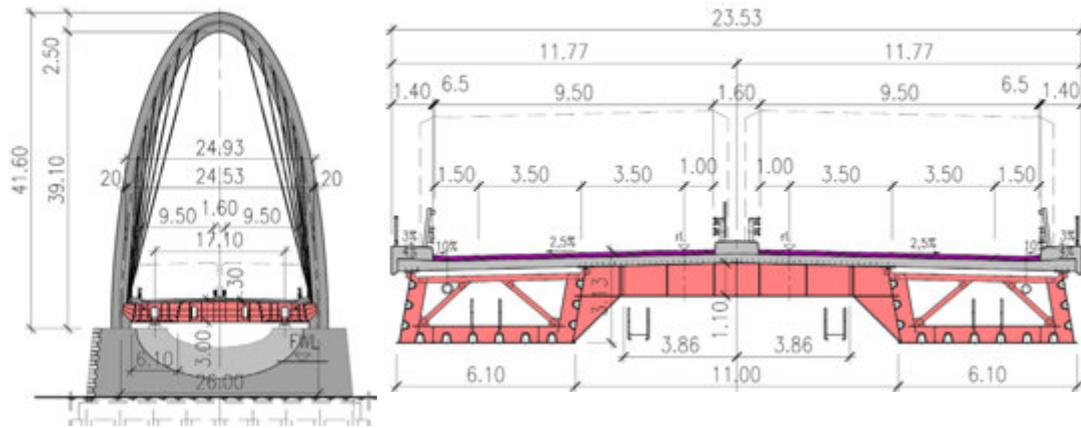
View of the pier with pylon and the cross-section of the bridge
